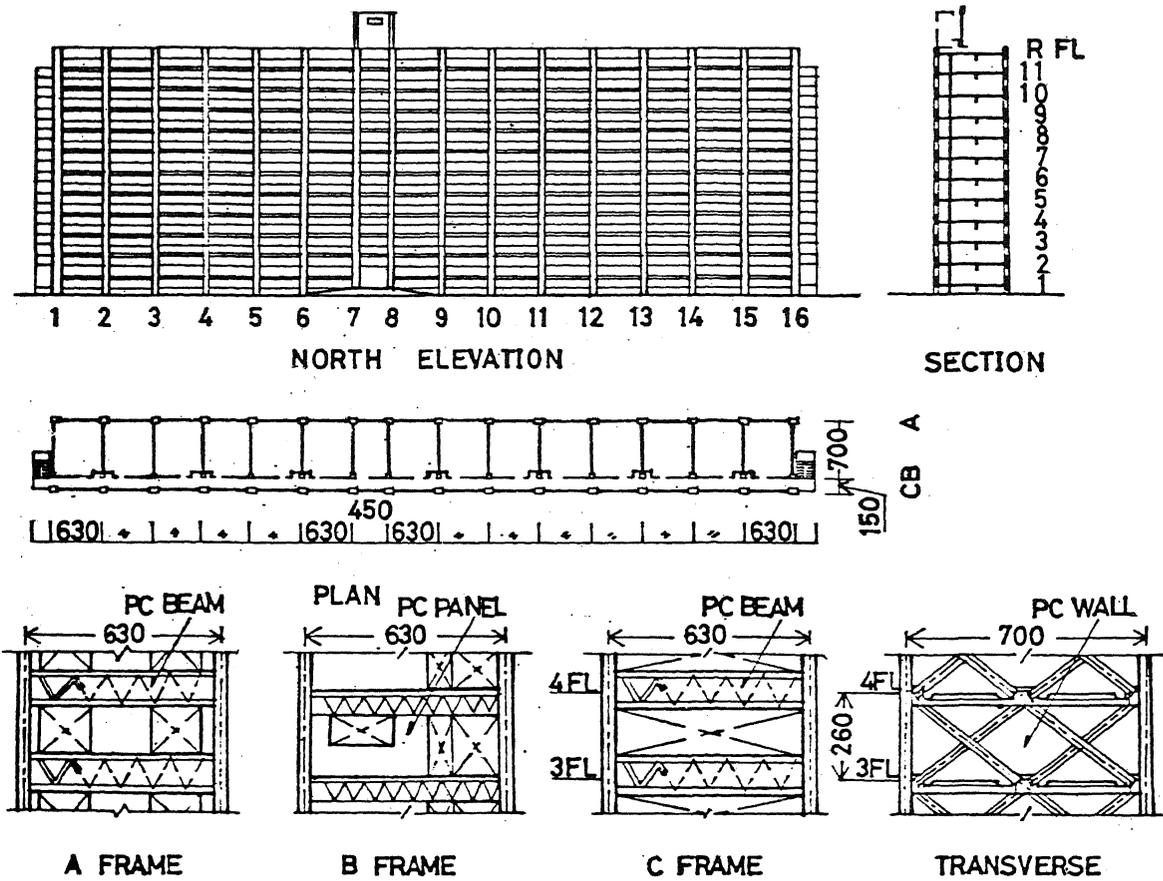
OUTLINE OF BUILDING AND DETAILS OF FRAMES.
